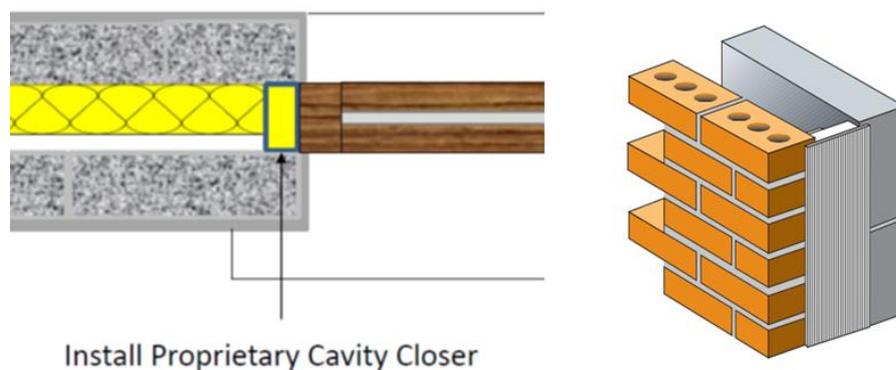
Proprietary Cavity Closer installed at Window opening
